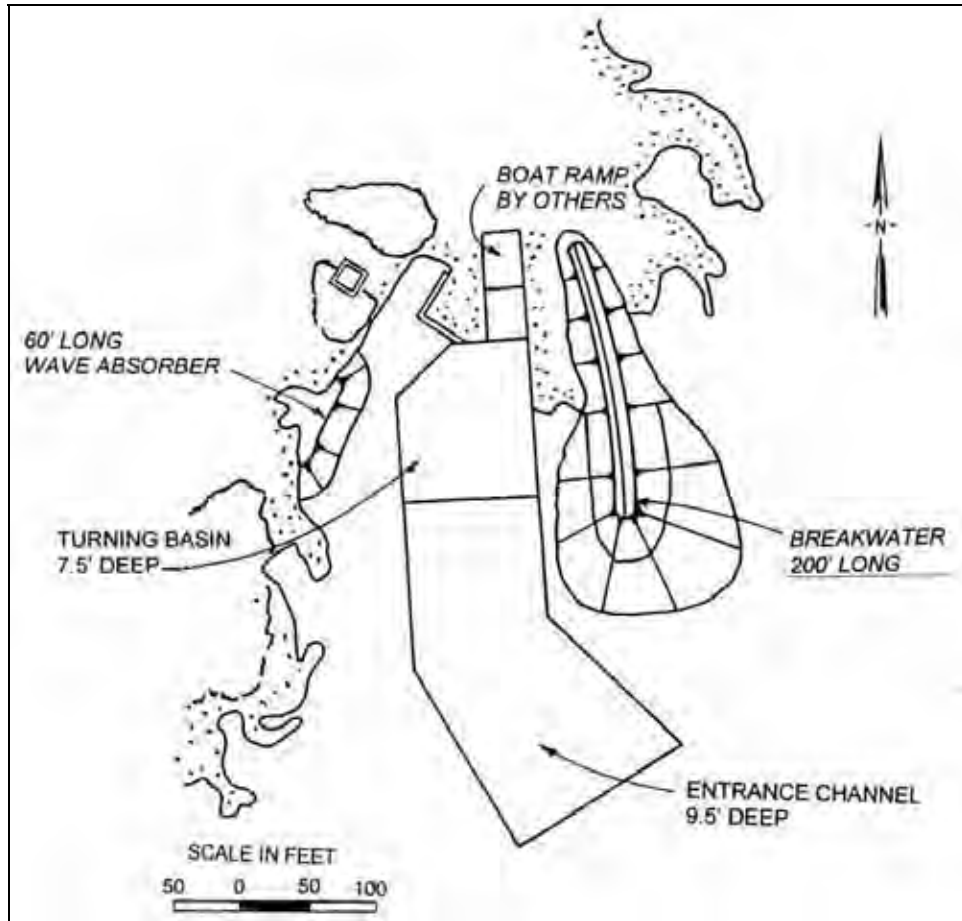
Layout of Laupahoehoe Boat Launching Facility.
